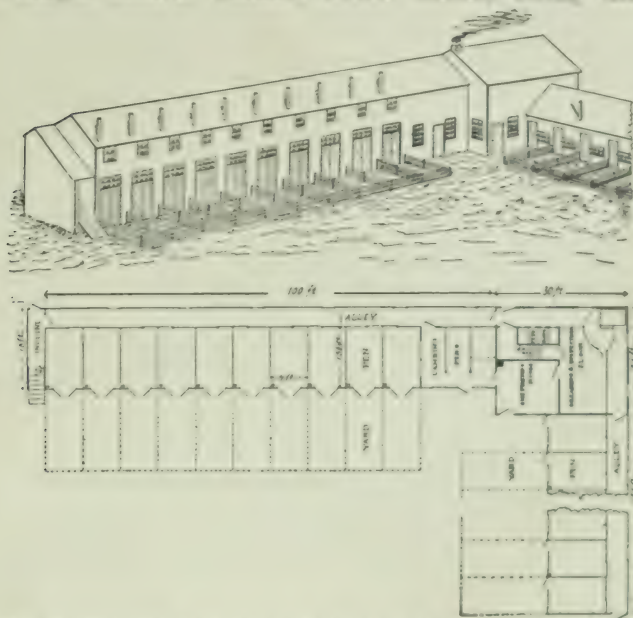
Showing floor plan and elevation of sheep stable in which the outtakes are too short, too small and more numerous than needed; and where no intakes have been provided, as should have been.
